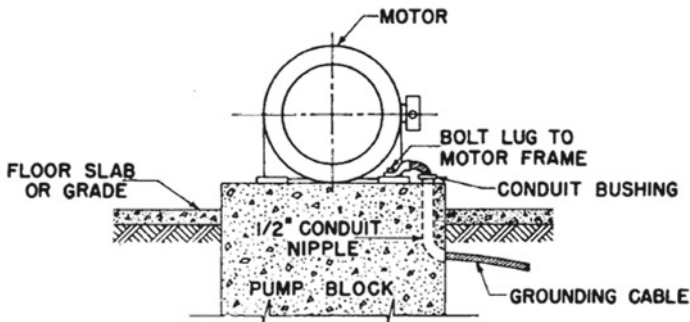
Motor bonding to ground connection. Adapted from Benjamin and Cundelan [1]
